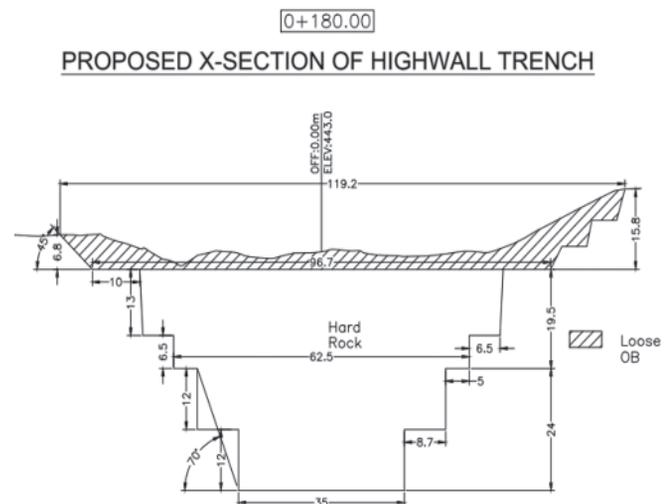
Cross-section of highwall trench at Sharda OCP with 70° slope angle
